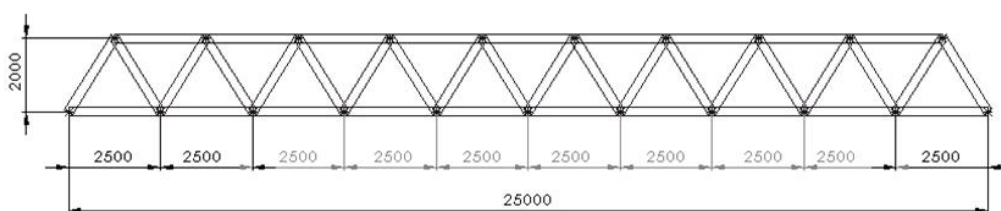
Elevation of the 25 m span lightweight FRP bridge
